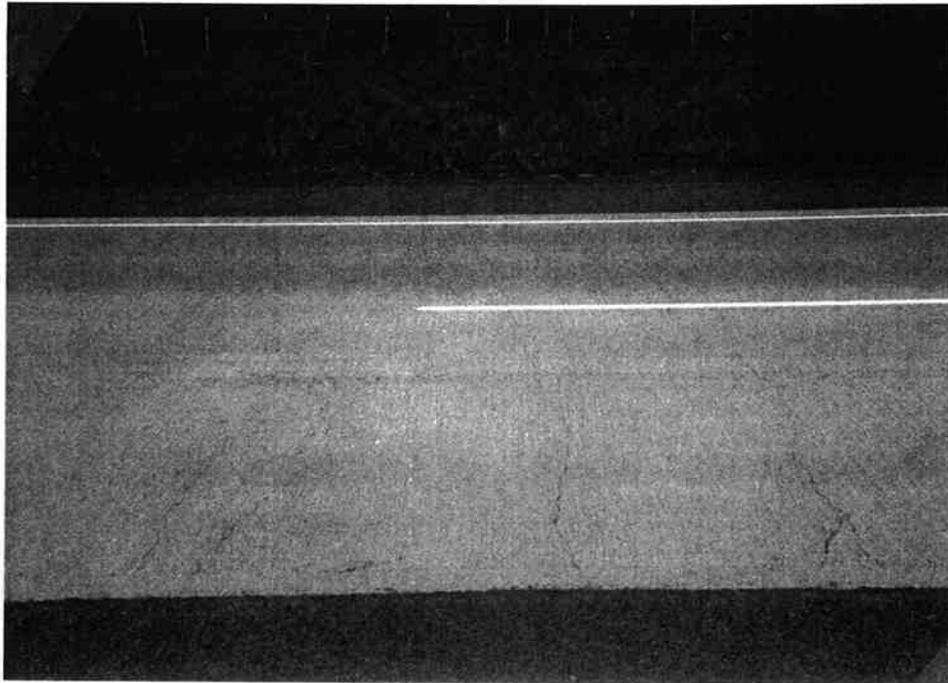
Typical Cracking Pattern in the CRC Pavement (1992)
